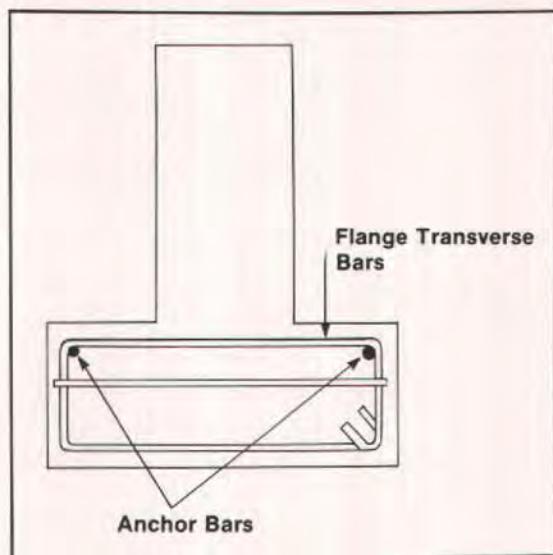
Anchorage of flange transverse bars without the use of welding.
